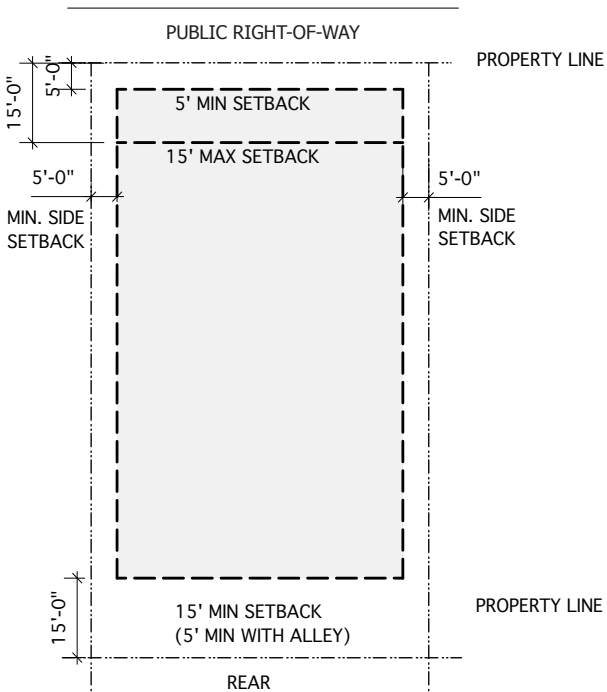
SU-2/VTSL BUILDING PLACEMENT DIAGRAM
